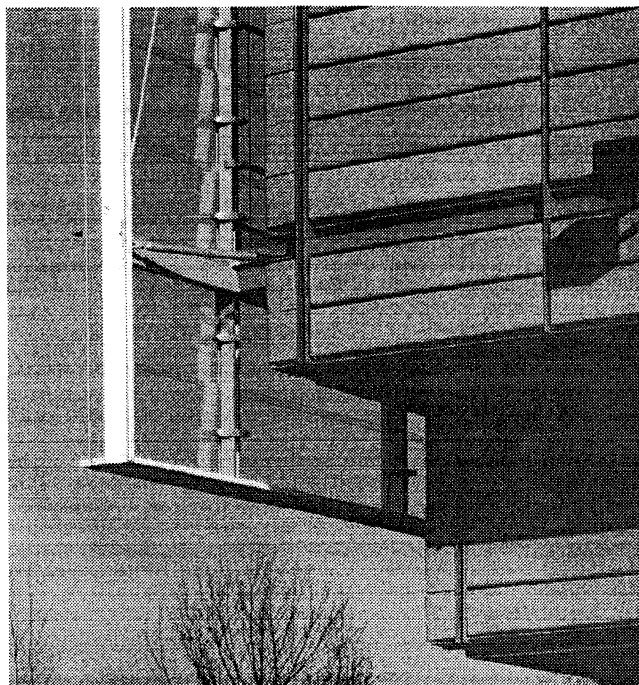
Mixed-use Building, Lyons, France, 1995, The Renzo Piano Building Workshop.
